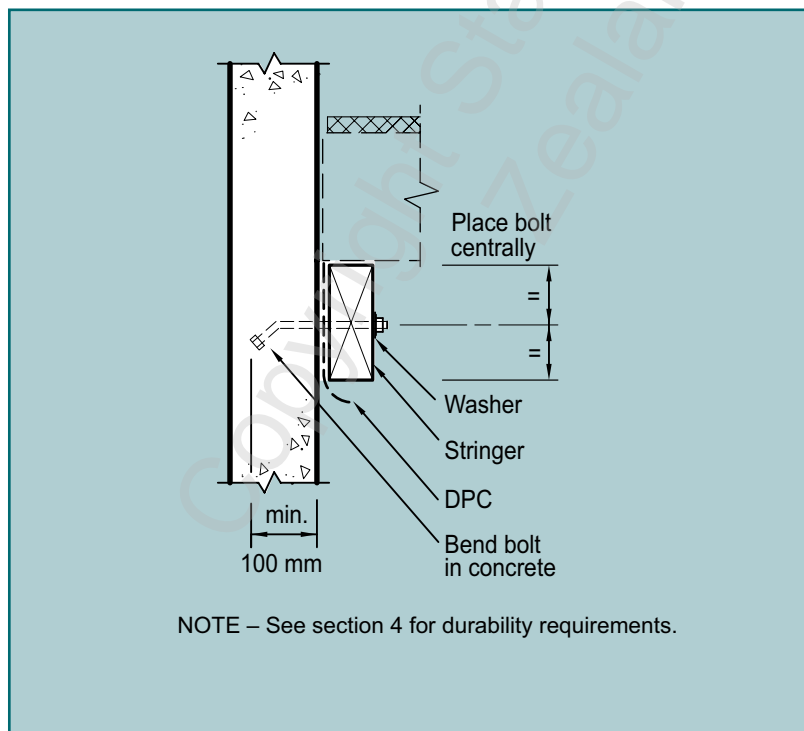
Fixing of stringers to foundation walls (see 6.13.2)
